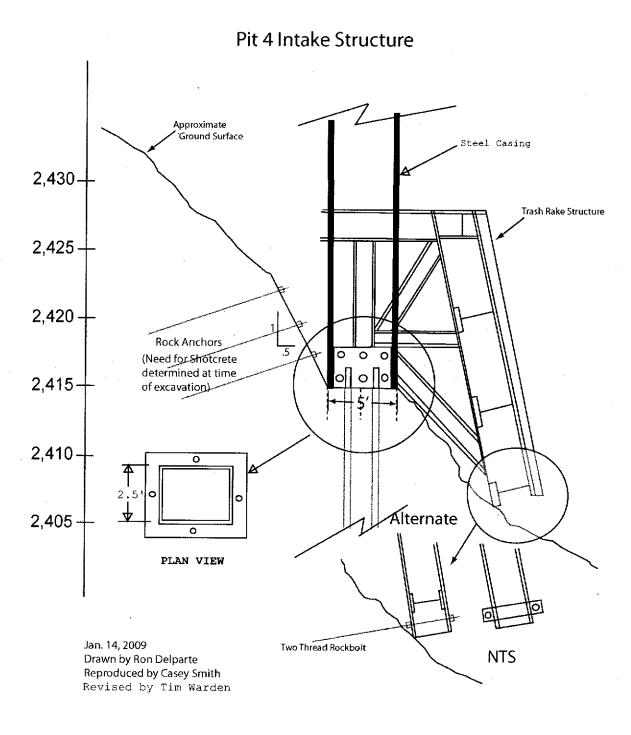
Illustration of Pit 4 Dam flow release facilities footing structure
